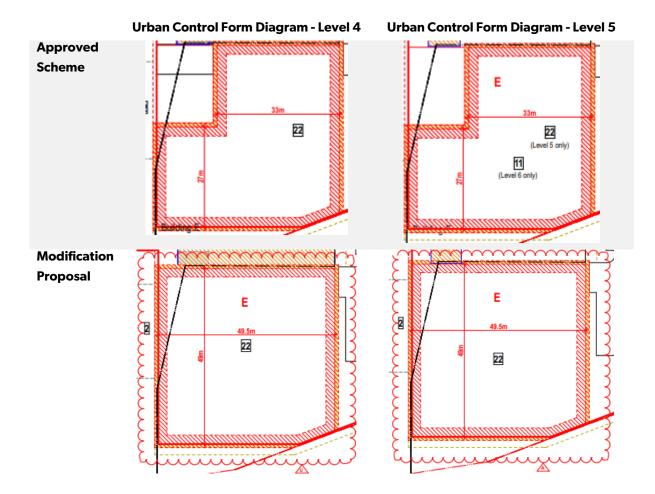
| Urban Control Diagram comparison of approved and modification proposal (Source: Approved Architectural Plans and Proponent's Modification Application)
